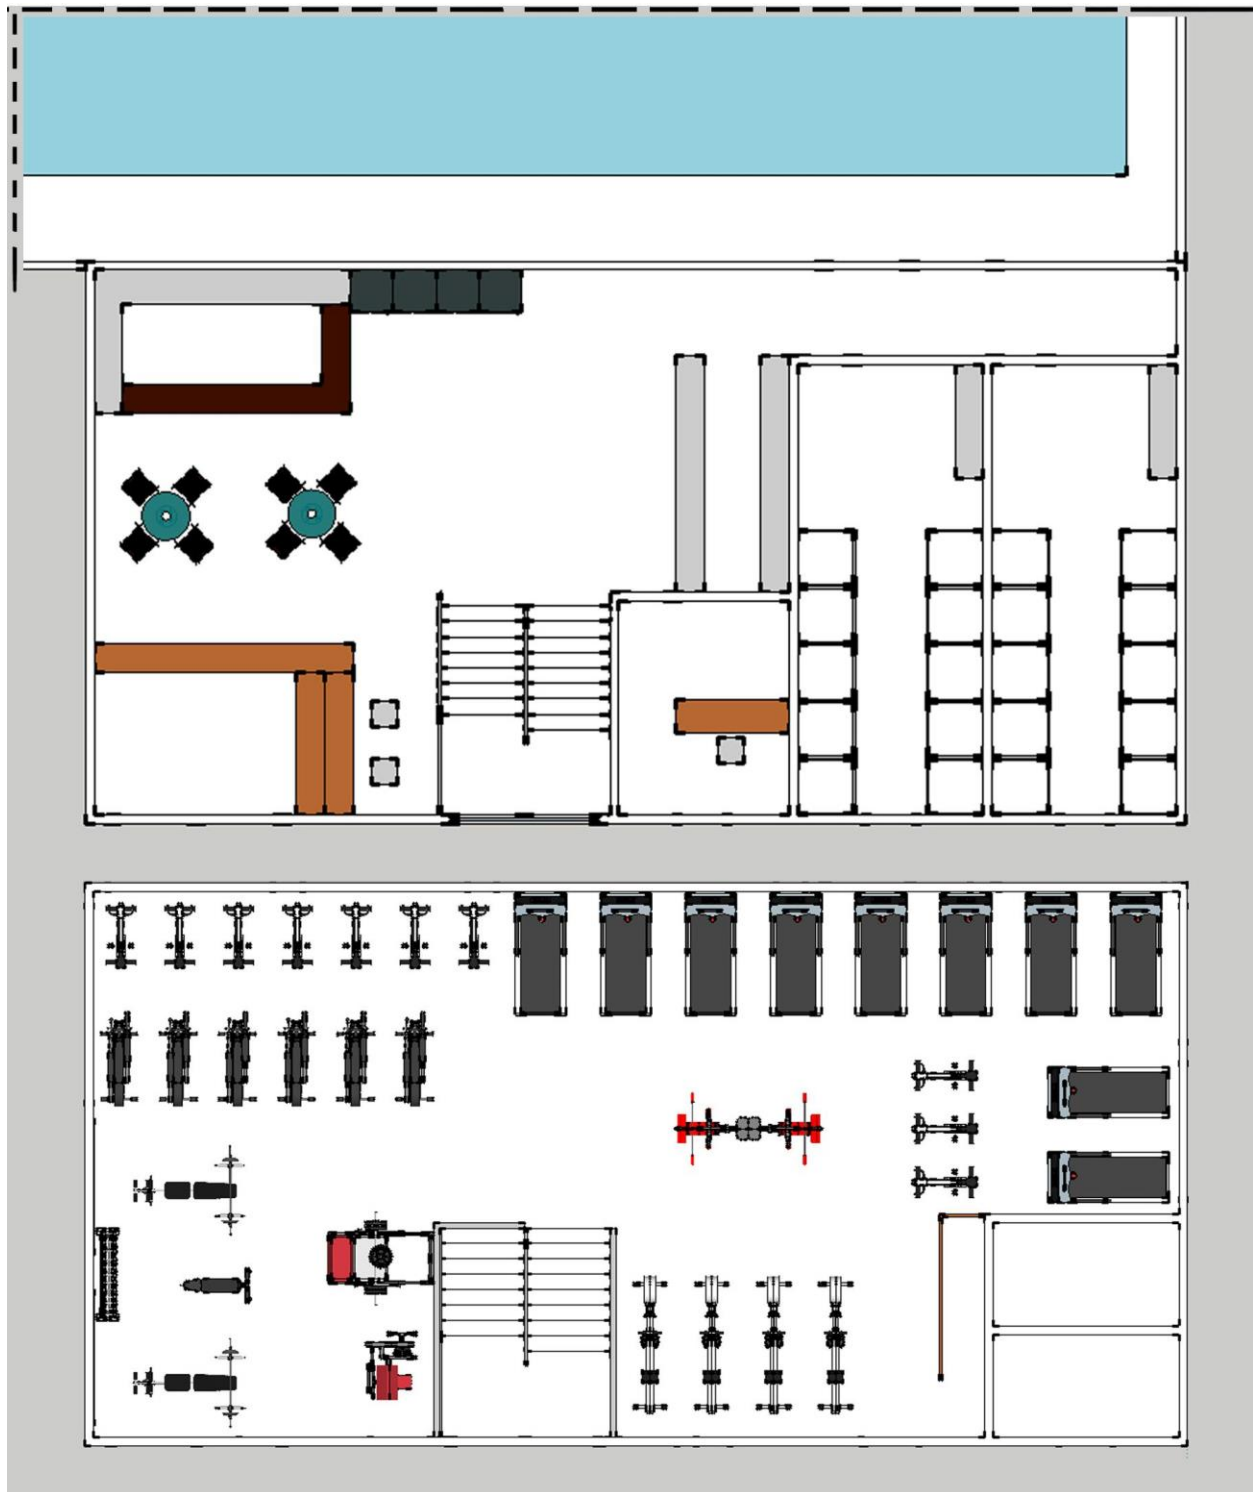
Complete Layout. Ground floor with pool and top floor.
